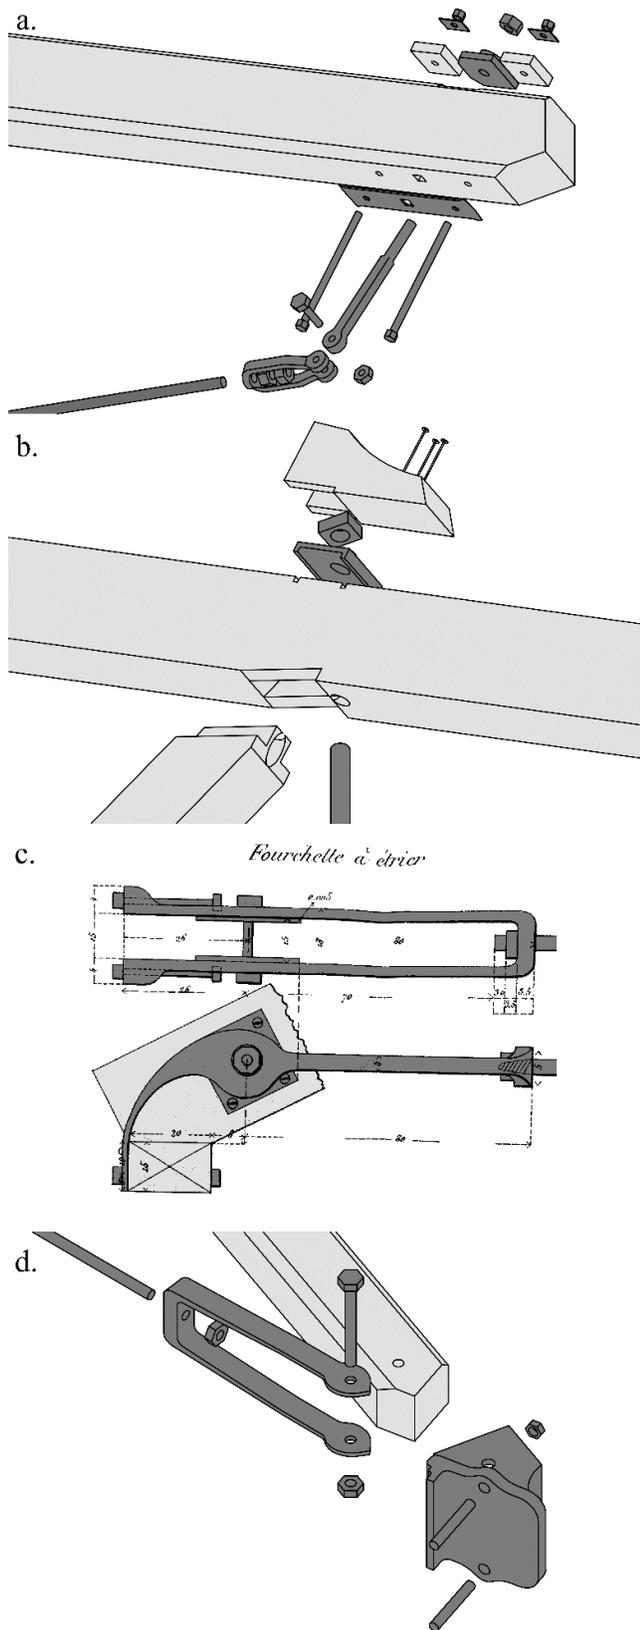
a. Connection between rafter's foot and iron tie in a Polonceau truss. Span: 18.5 m (riding hall, Hermalle-sous-Huy, 1856).
